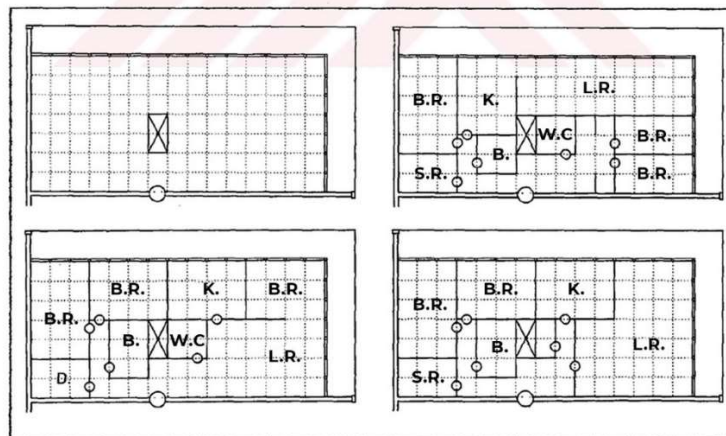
Support structure floor plan of flexible housing block applied in France and possible alternative space organization examples in a housing unit inside the block, translated into English by author [4].
